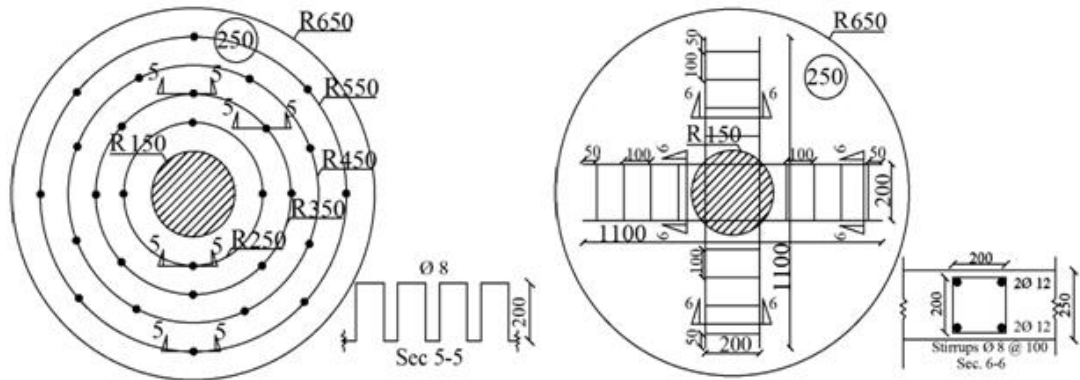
Concrete dimensions and reinforcement details of tested specimens
